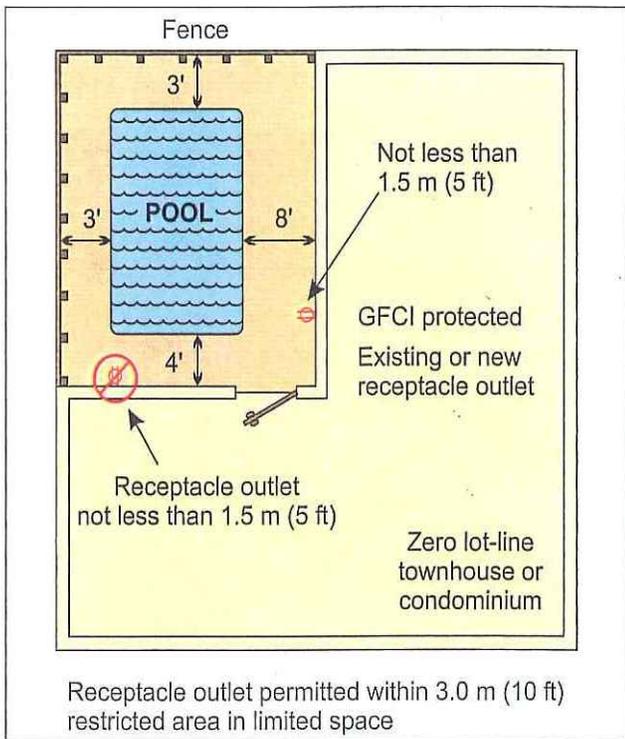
Restricted space receptacle locations permitted on lots with size restrictions and limitations
